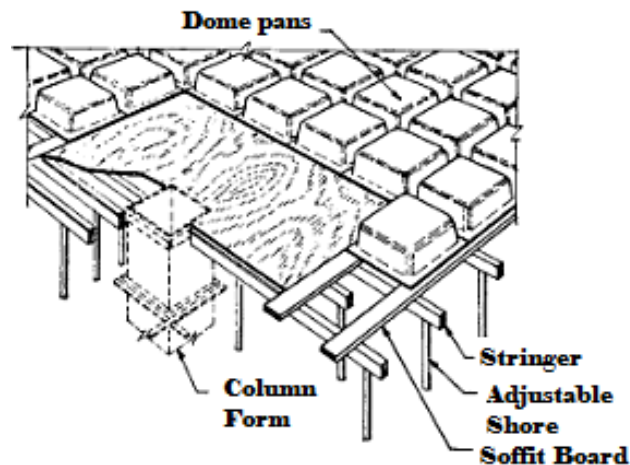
Two-way joist slab forming with prefabricated dome pans (Hurd, 1995)
